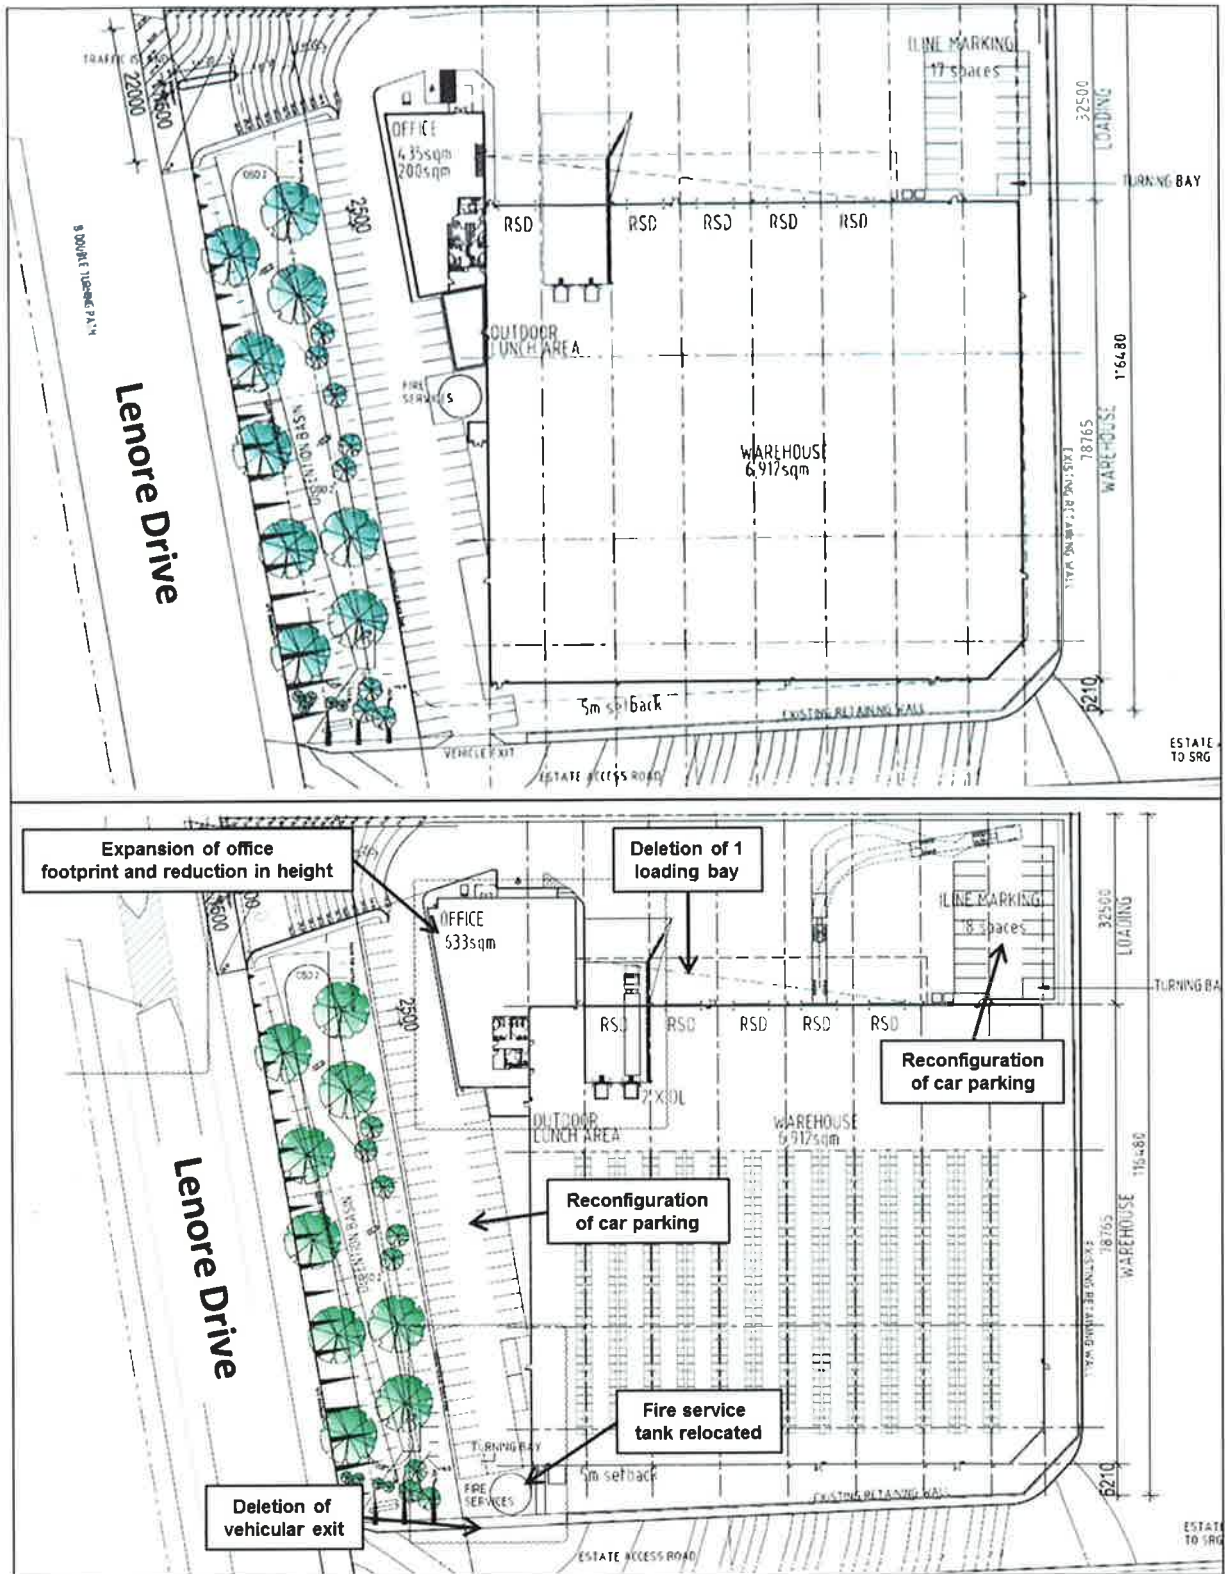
Approved (top) and proposed (bottom) office/warehouse layout
